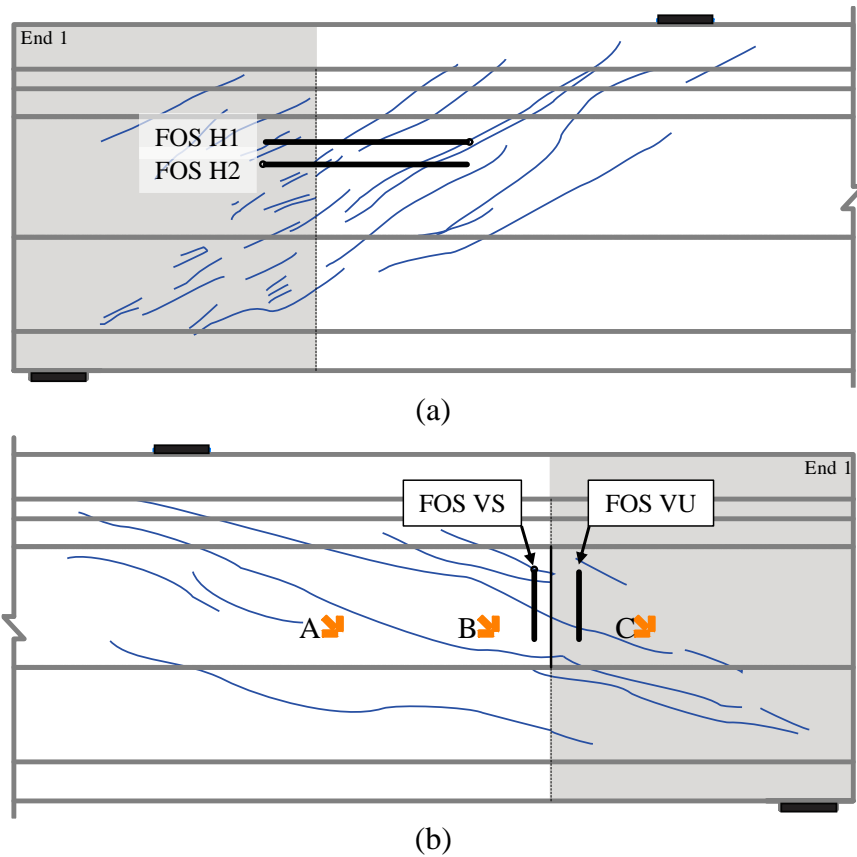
Crack patterns at final load on (a) front face and (b) back face
